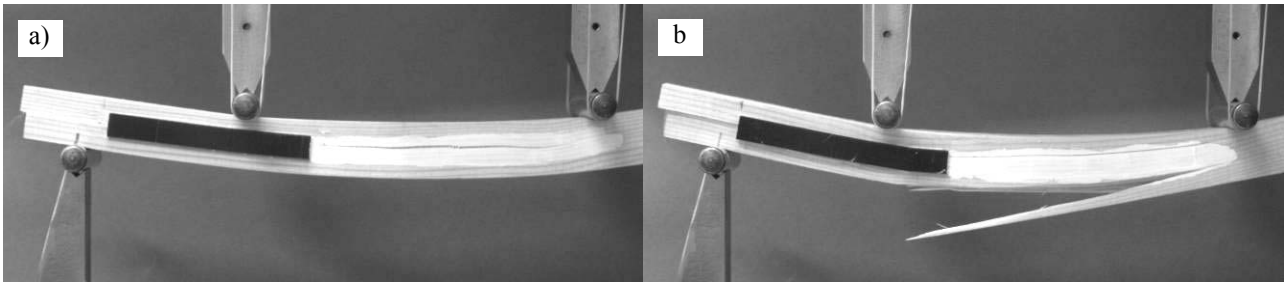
Crack propagation at the horizontal shear crack tip (a) and cross-graining between the loading cylinders (b) for a $L_p=75$ mm repair.
